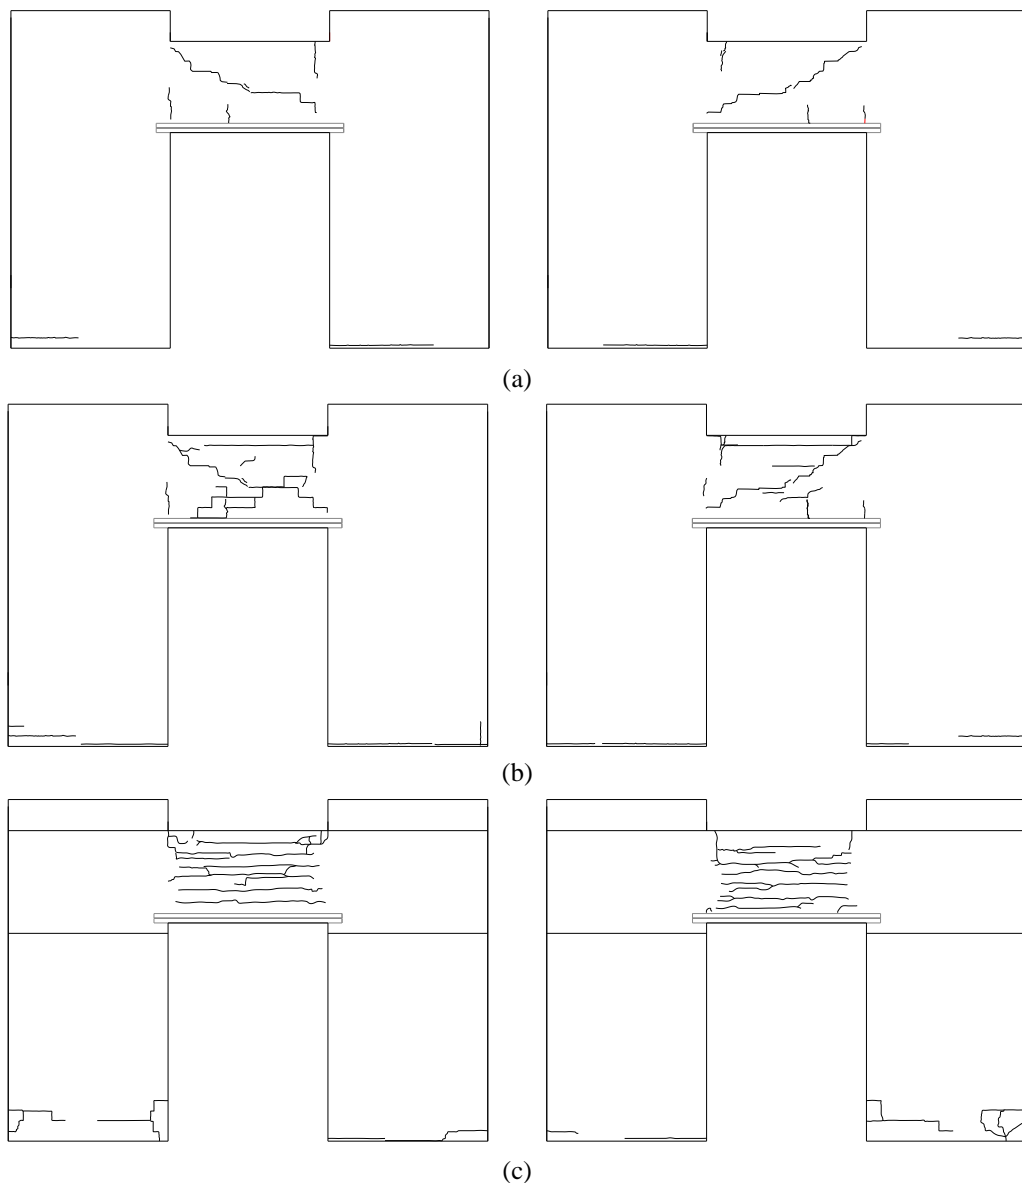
Damage patterns: (a) as-built wall; (b) pre-damaged wall; (c) repaired wall
